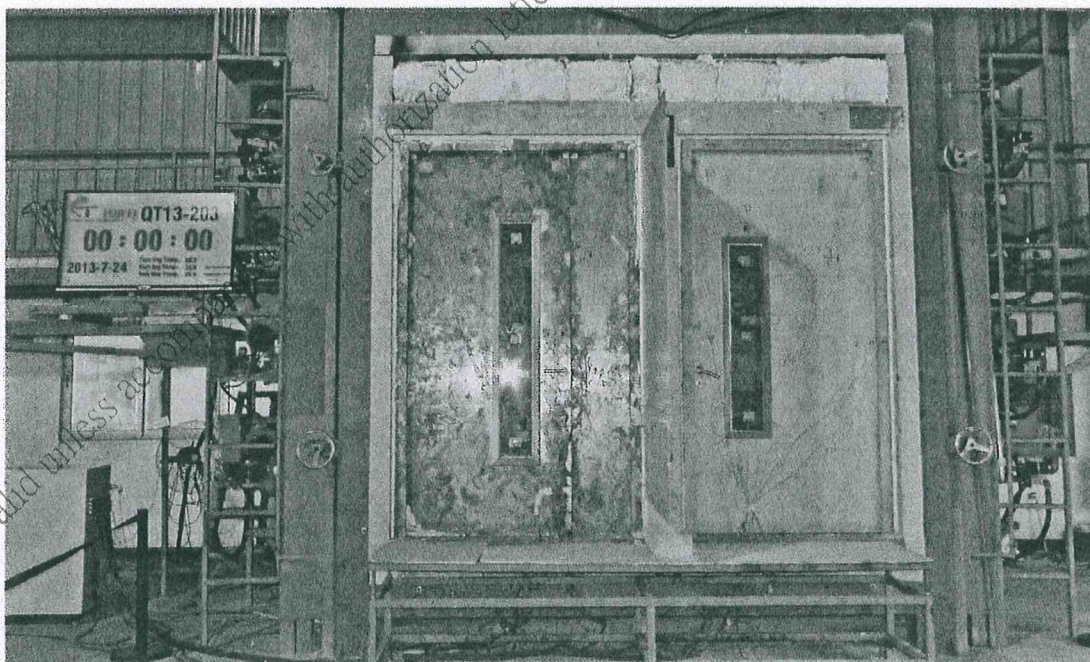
Unexposed surface of the before the test. (Left: Door A; Right: Door B)
